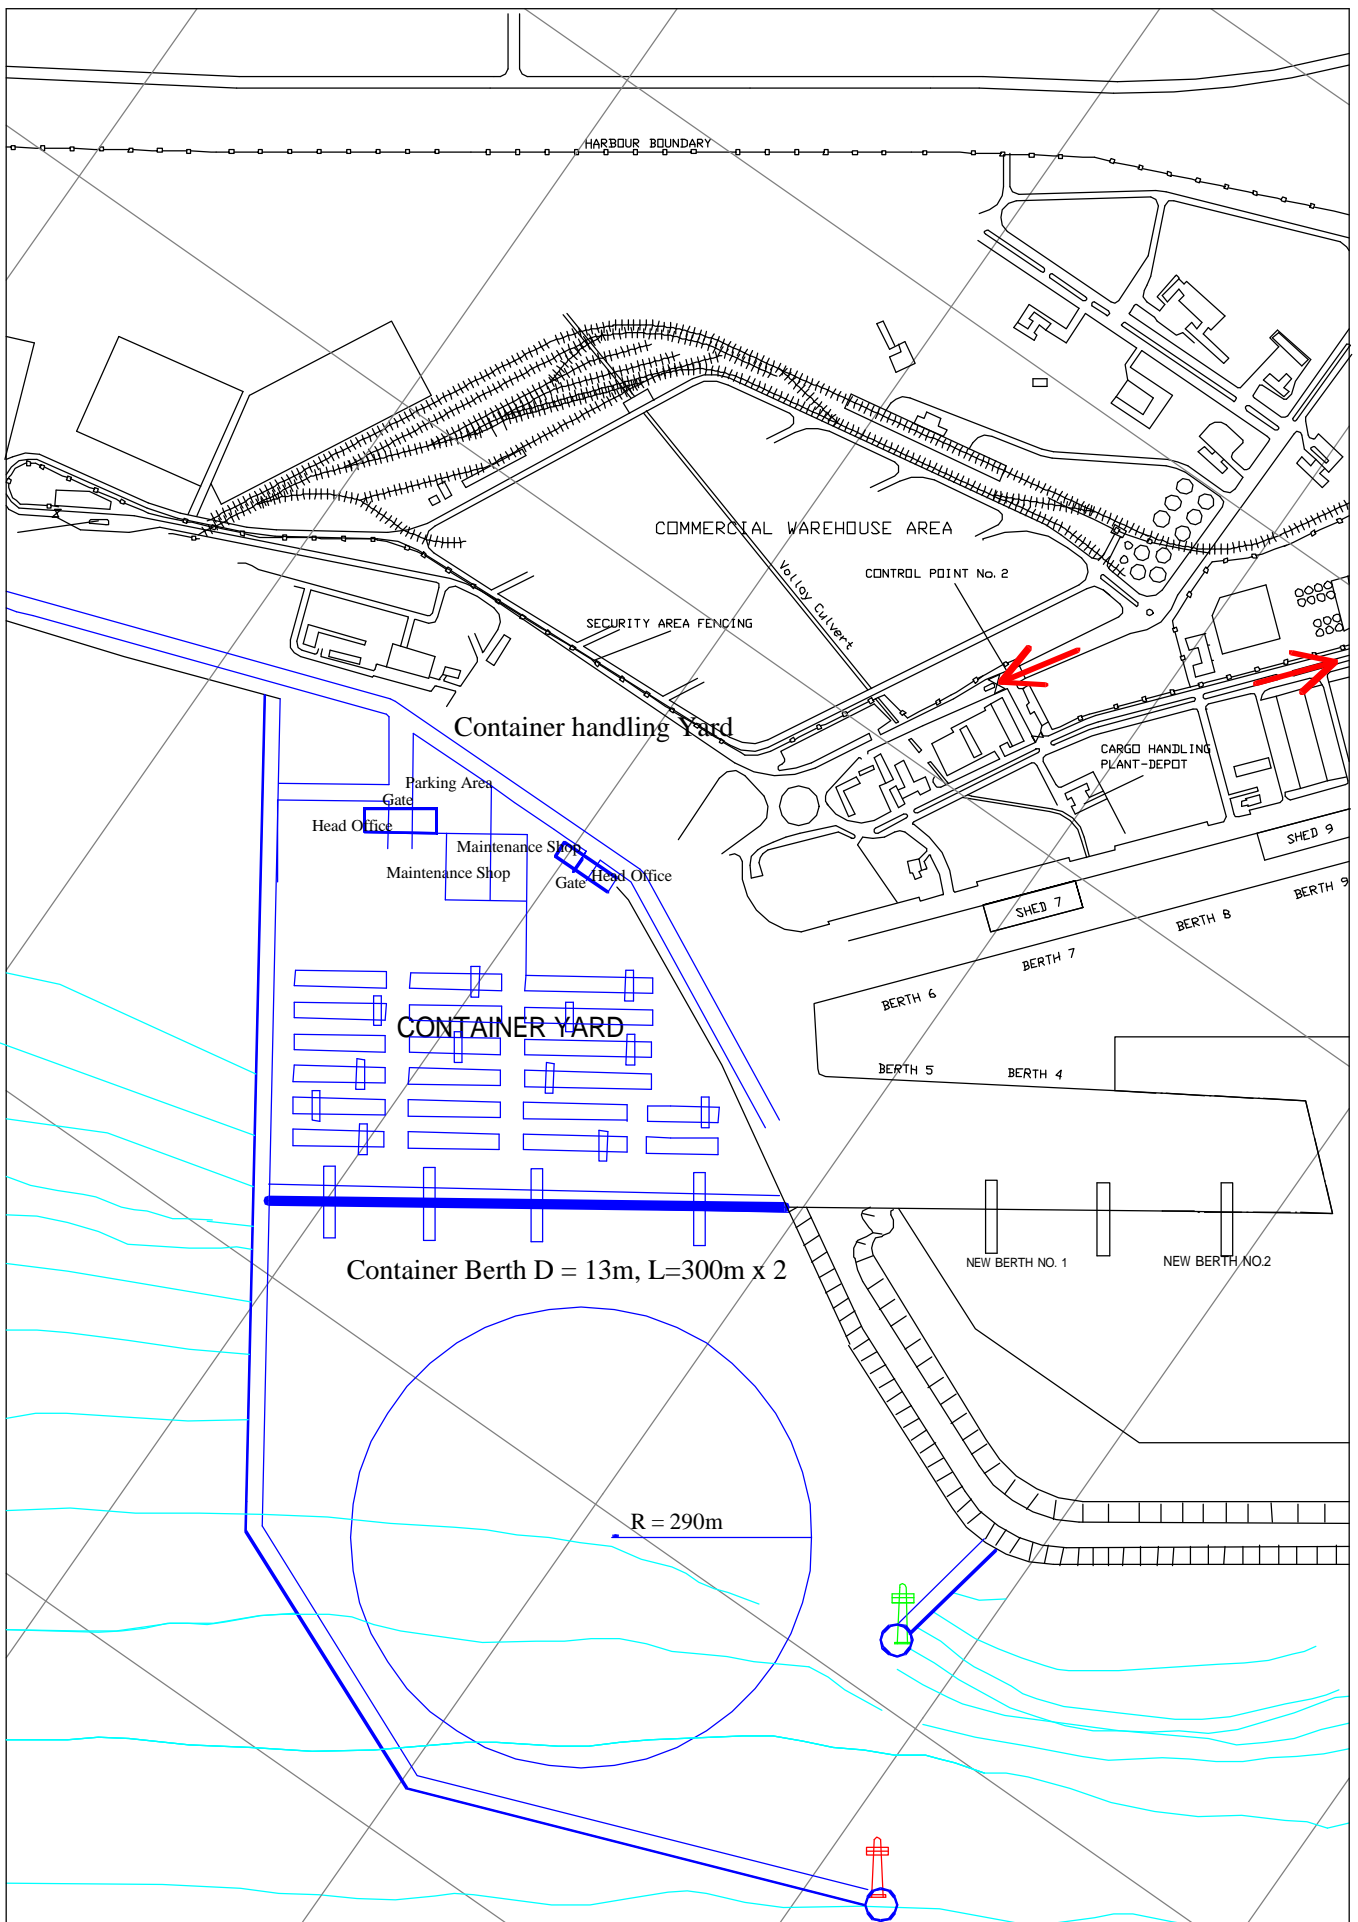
SHORT-TERM DEVELOPMENT PLAN of Tema Port (Main Facilities)
